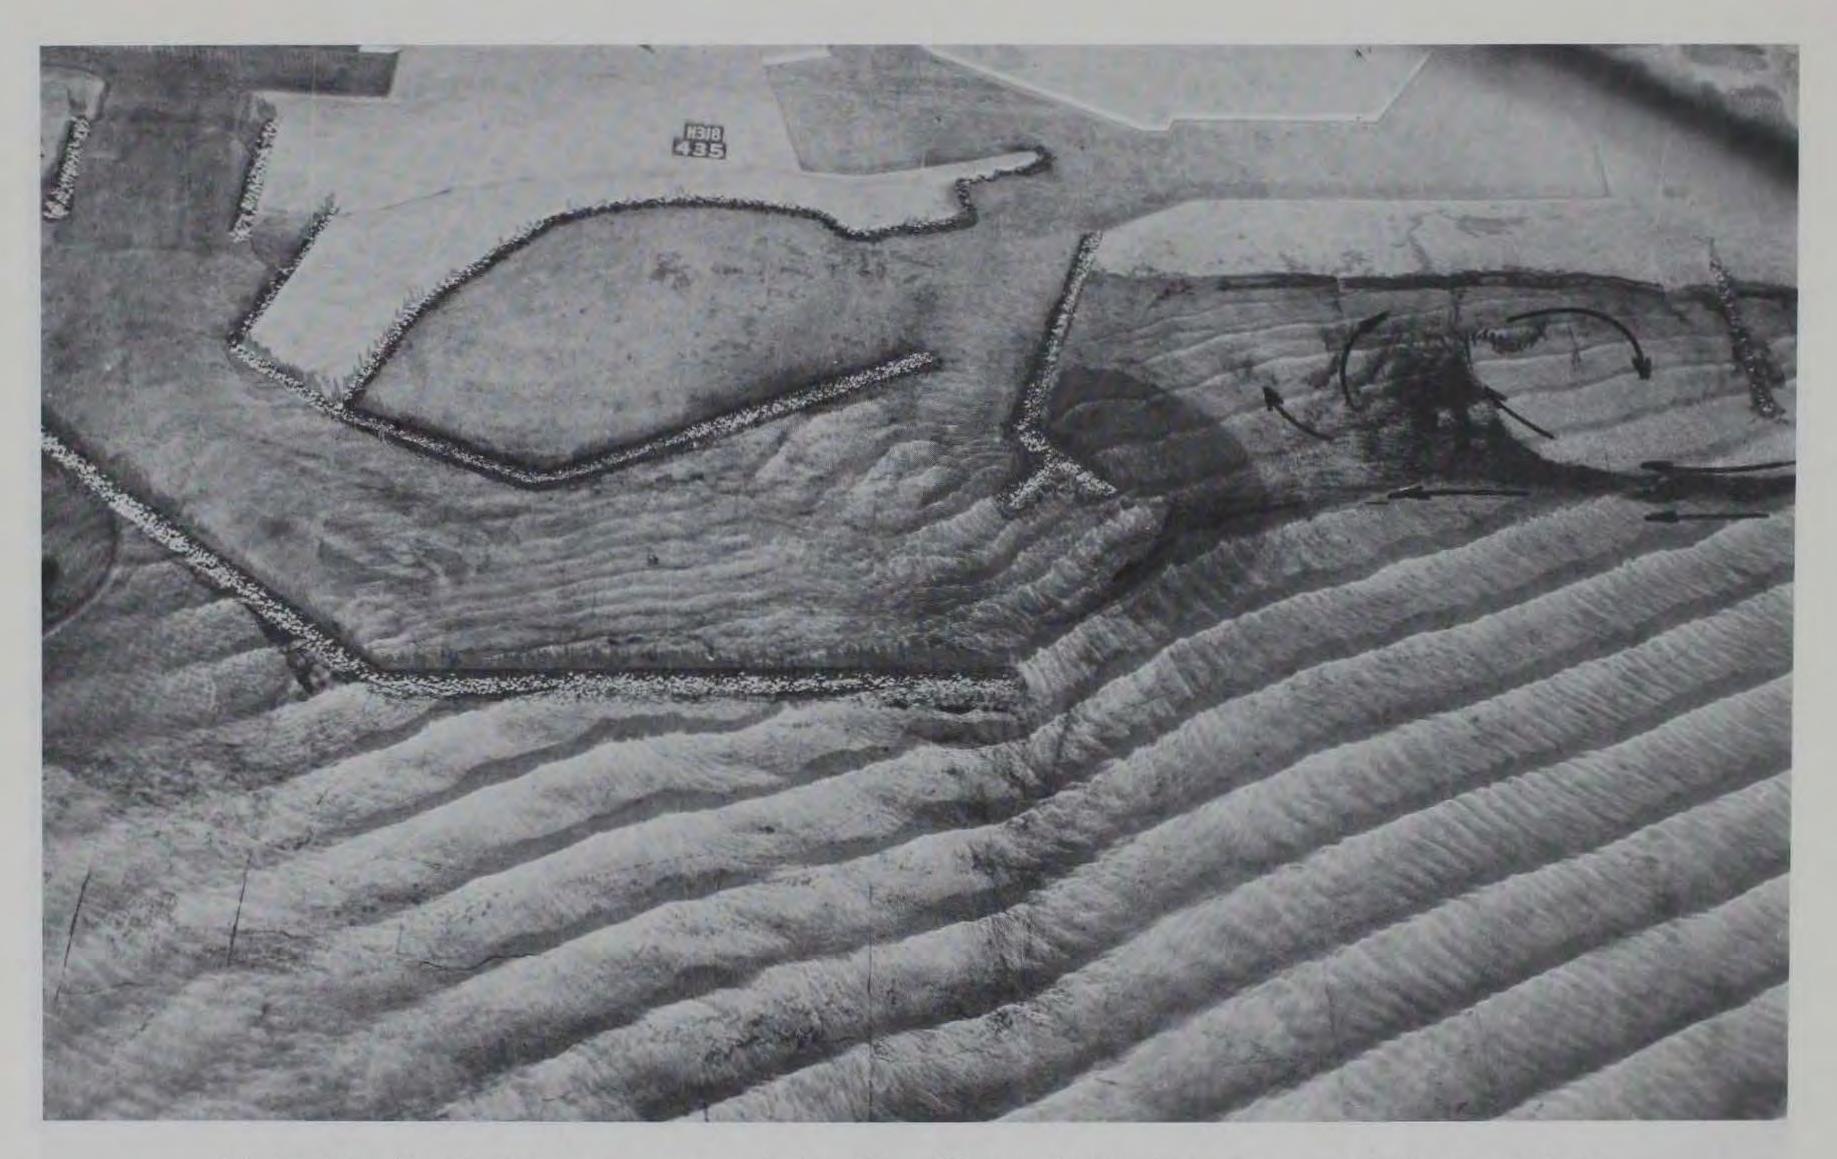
Typical tracer movement for Plan 62 resulting from 9-sec, 10-ft waves from south at mhhw
